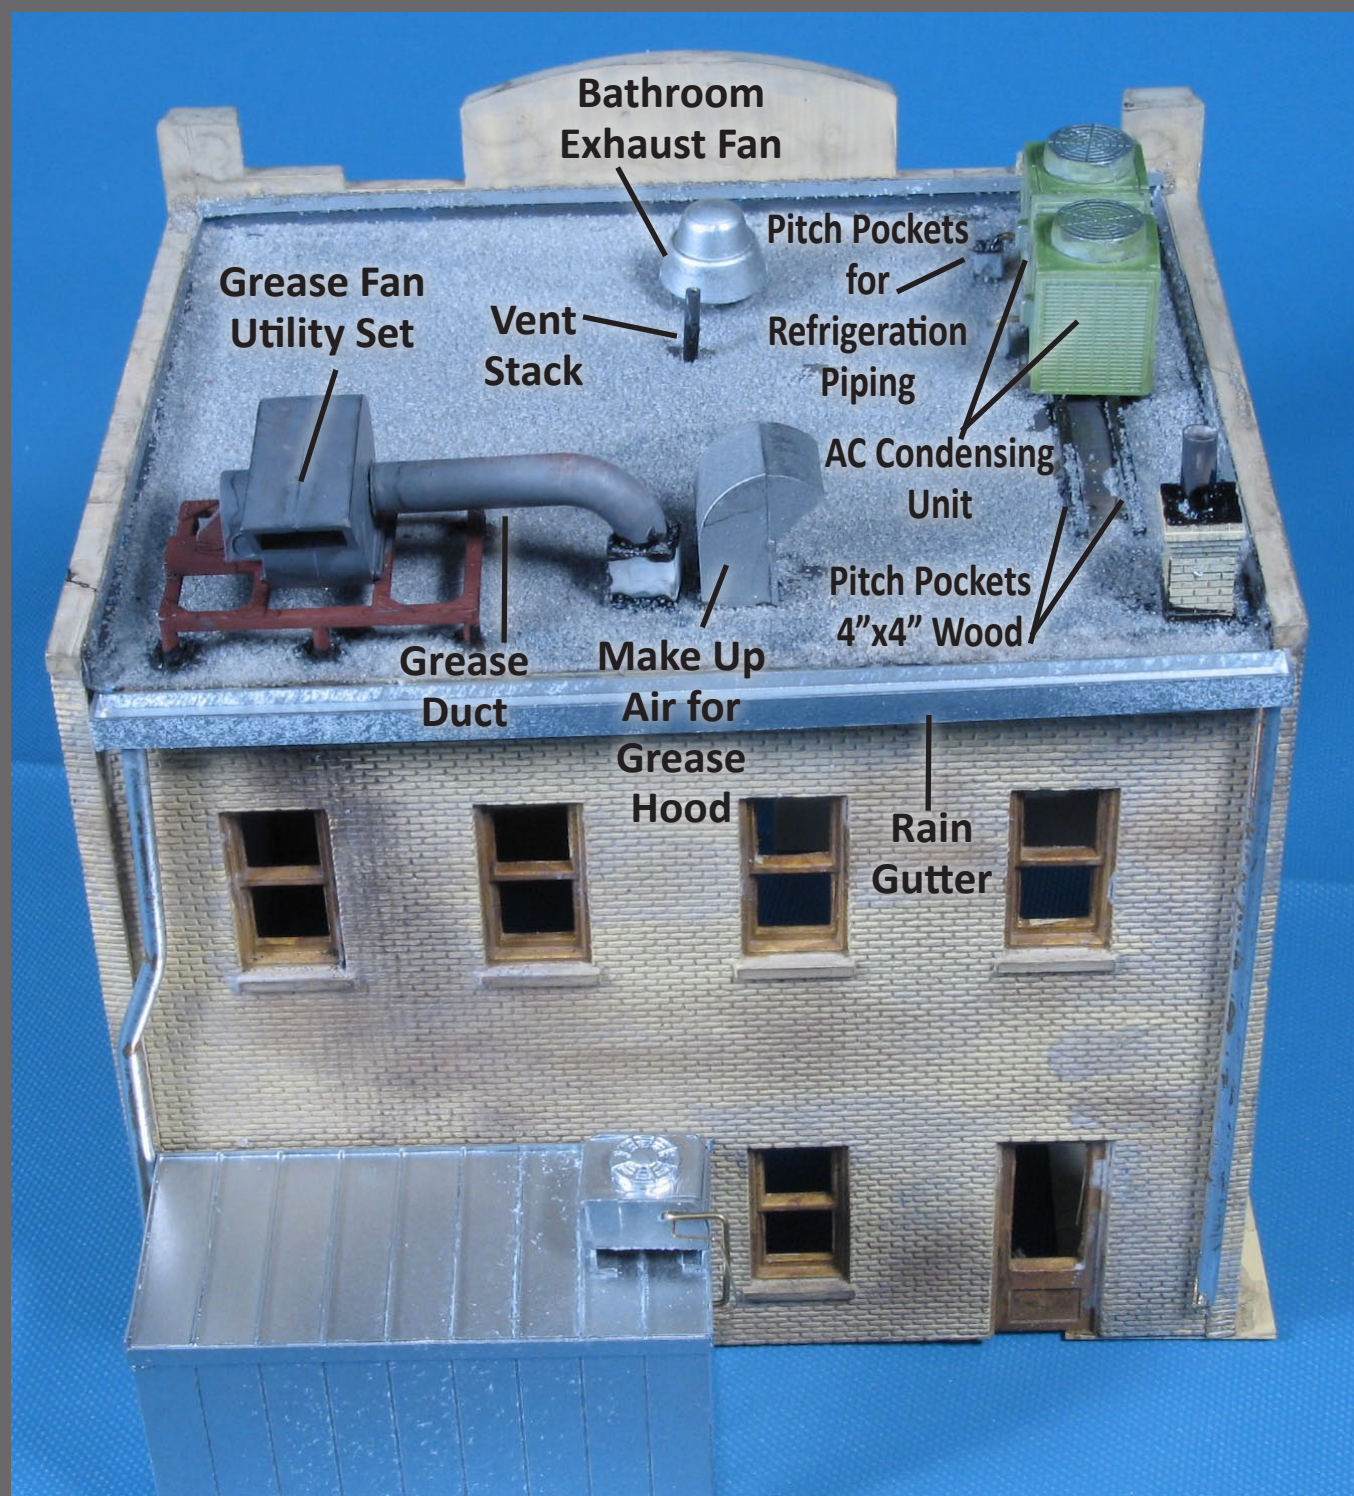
Grease exhaust fan, makeup air ductwork, condensers, bathroom exhaust fan, gutters and down spouts and the finished roofing gravel.
